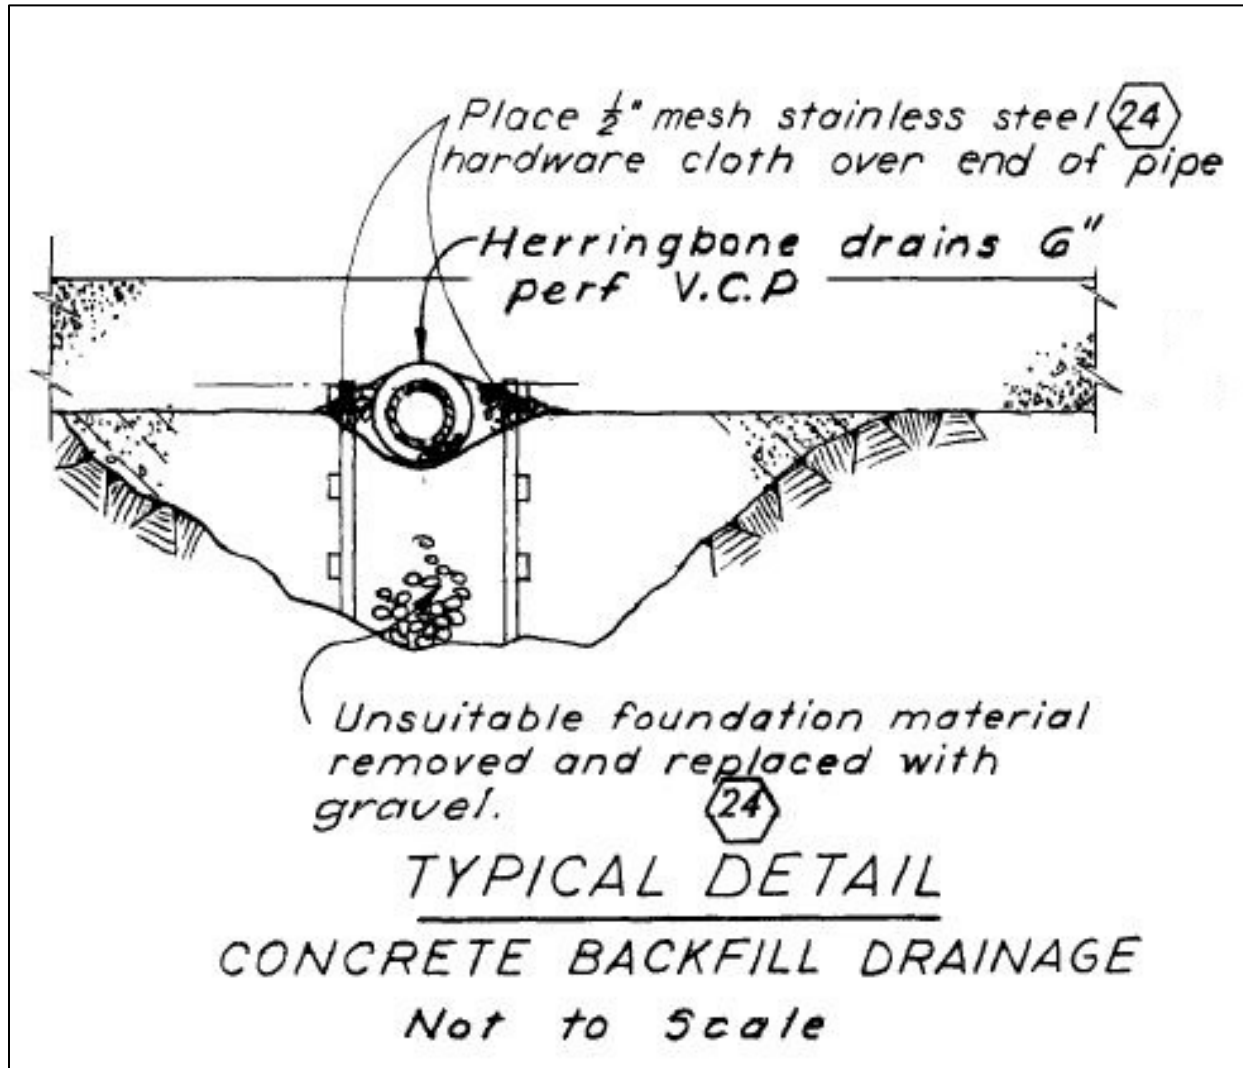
Herringbone Treatment Where Overexcavation Occurs (from Drawing A-3B9-1)
